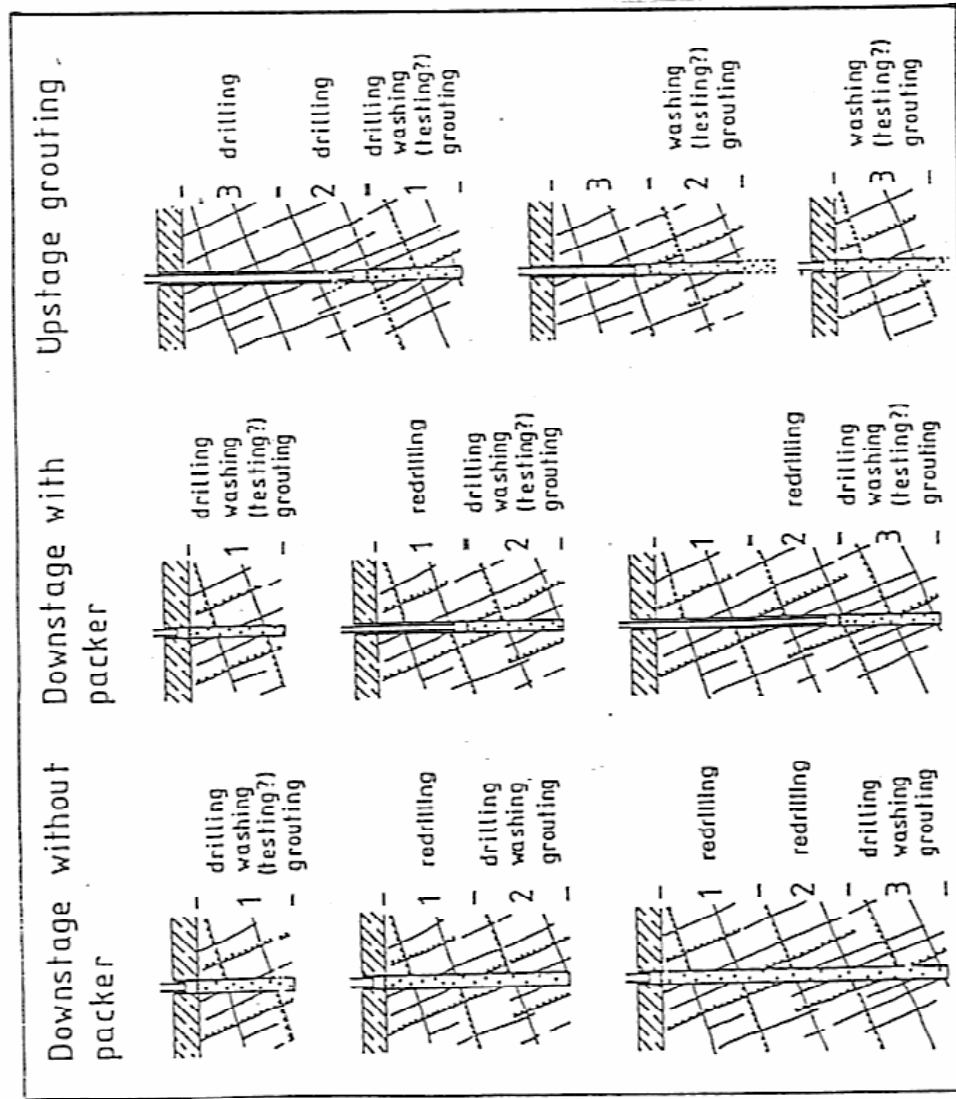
Conventional stage grouting methods for rock fissure grouting (Ewart, 1985).
